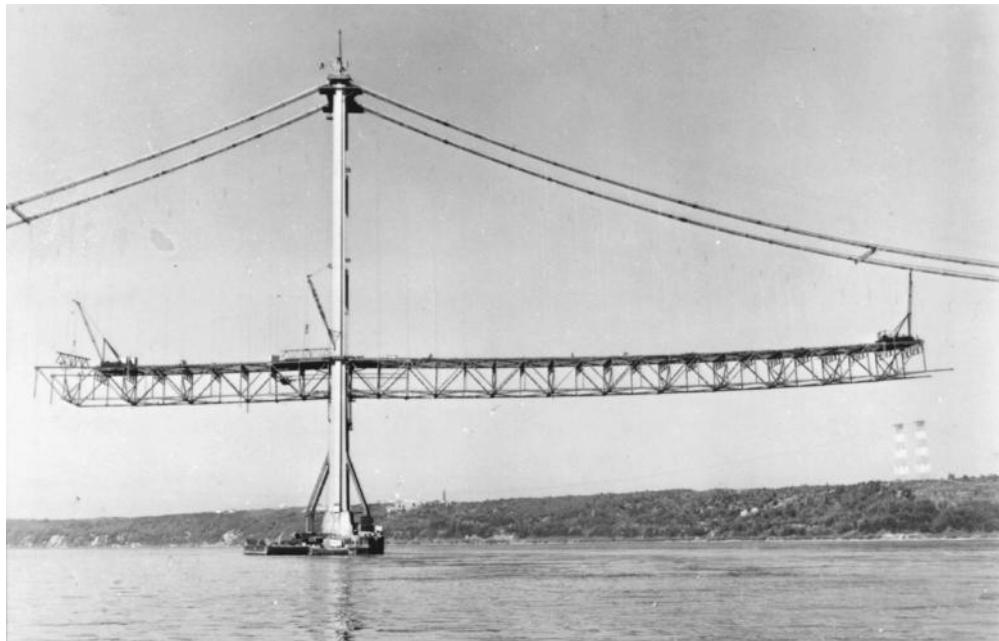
Erection of suspended deck steelwork, second Tacoma Narrows Bridge, Washington, 1950. Chicago boom on tower raises deck steelwork components to deck level, where they are transported to deck travelers by material cars. Each truss double panel is connected at top-chord level to previously erected trusses, and left open at bottom-chord level to permit temporary upward deck curvature, which results from partial loading condition of main suspension cables. Main span (at right) is 2800 ft. (853 m), and side spans are 1100 ft. (335 m). Stiffening trusses are 33 ft. (10 m) deep and 60 ft. (18 m) on centers. Tower-base kneebraces (see Figure 1.24) show clearly here.
